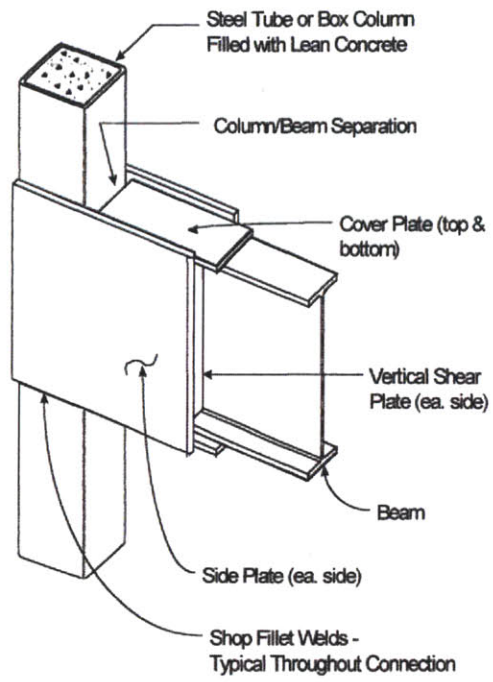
Side Plate* moment connection (Source: Punch, 138)
